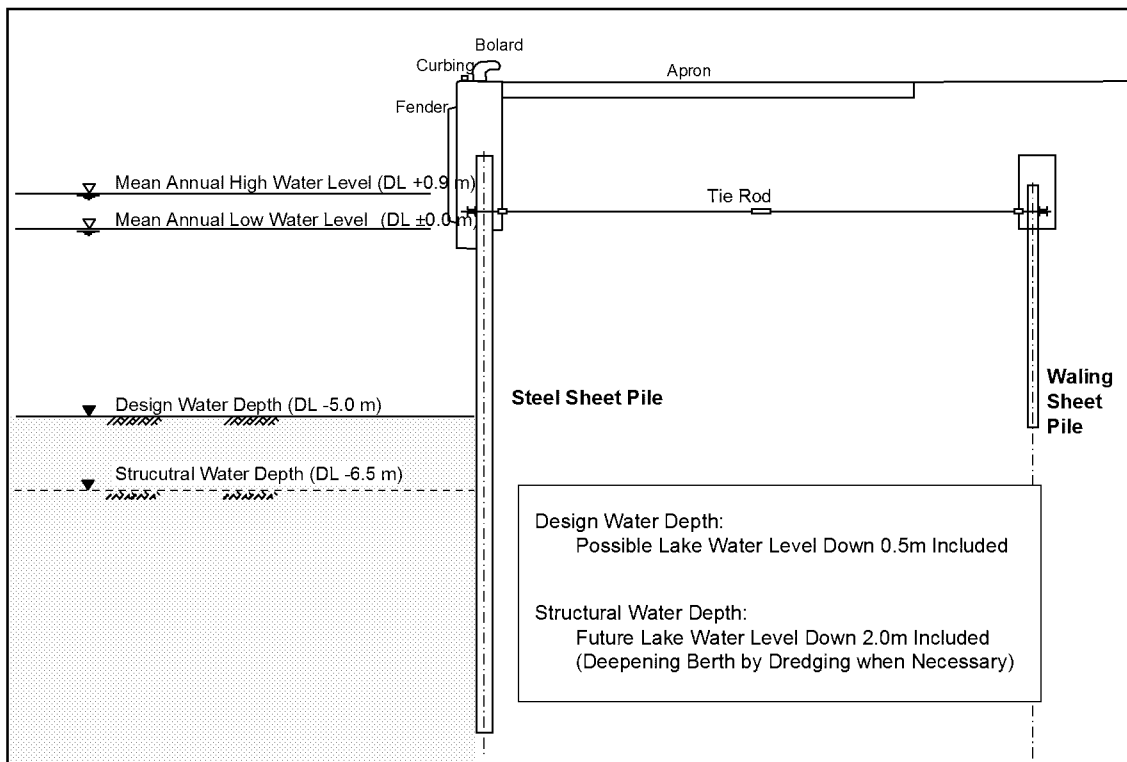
Structural Plan of Steel Sheet Pile Type Berth
